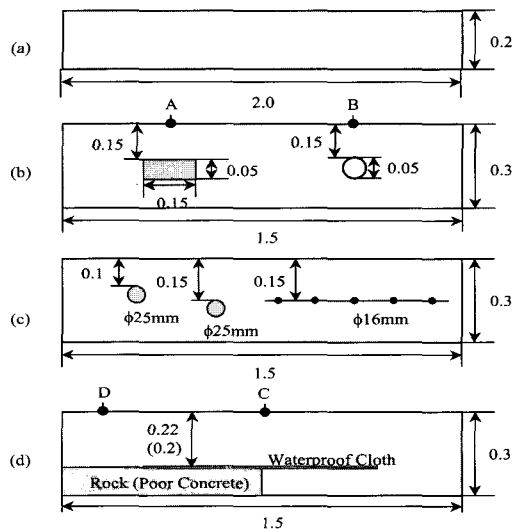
Cross sections of prepared concrete slabs [unit: m], containing (a) no inclusion, (b) styrofoam and plastic pipe, (c) steel rebars and mesh, (d) rock layer or poor concrete layer and waterproof cloth
